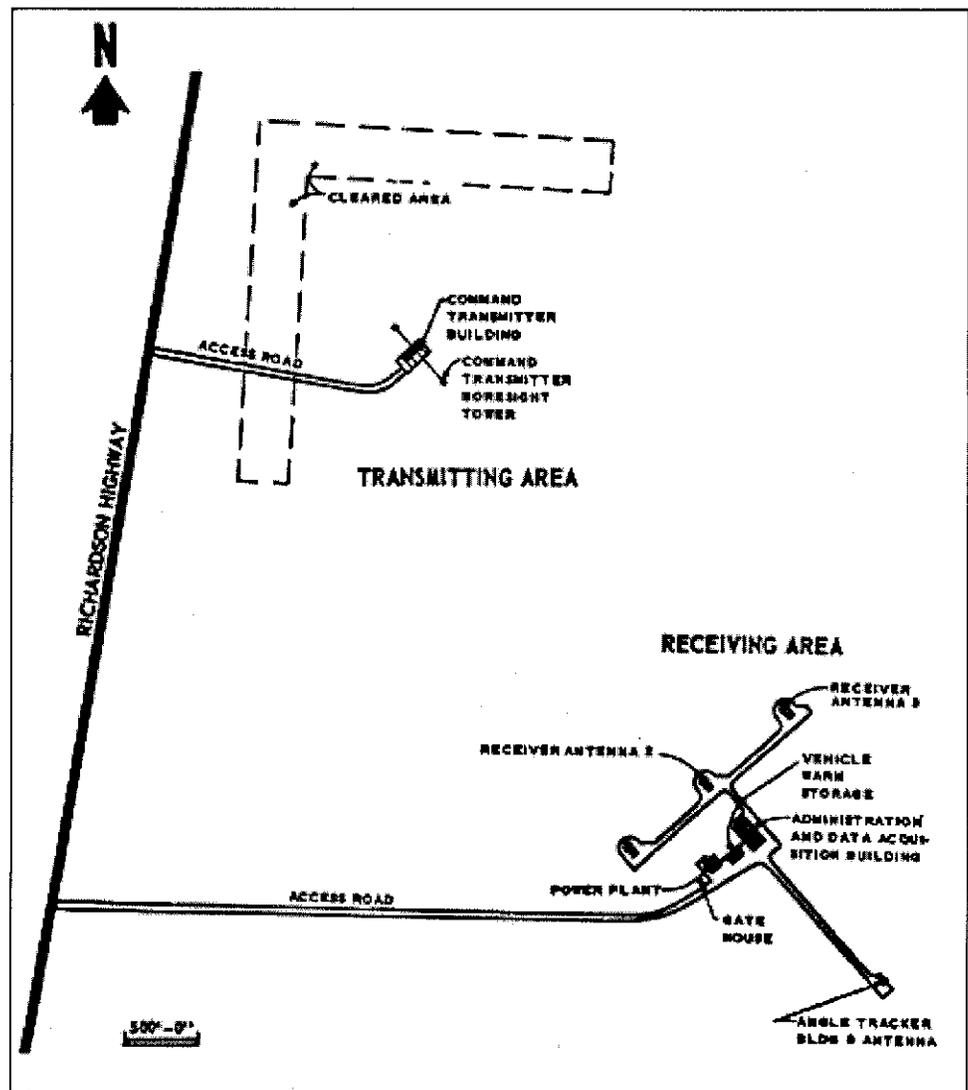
Site plan, Lockheed report 1961. Also see Appendix C as-built site plan.
